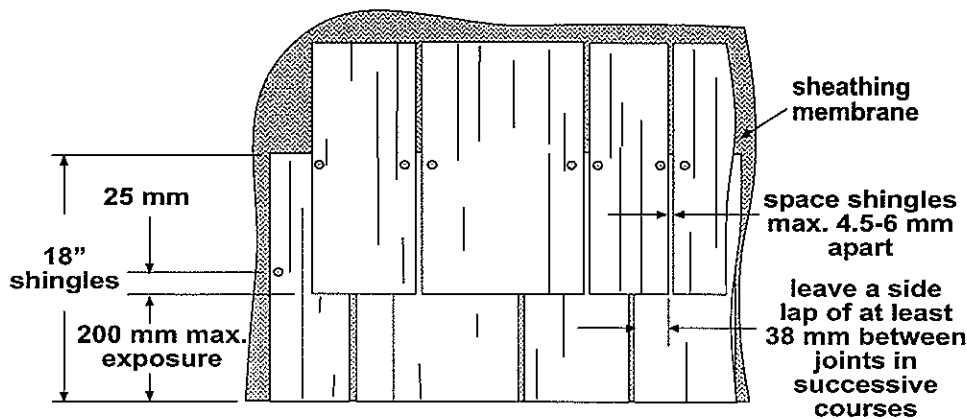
Detail of installation of Hardie® Shingleside® Cladding (Shingle Spacing)
